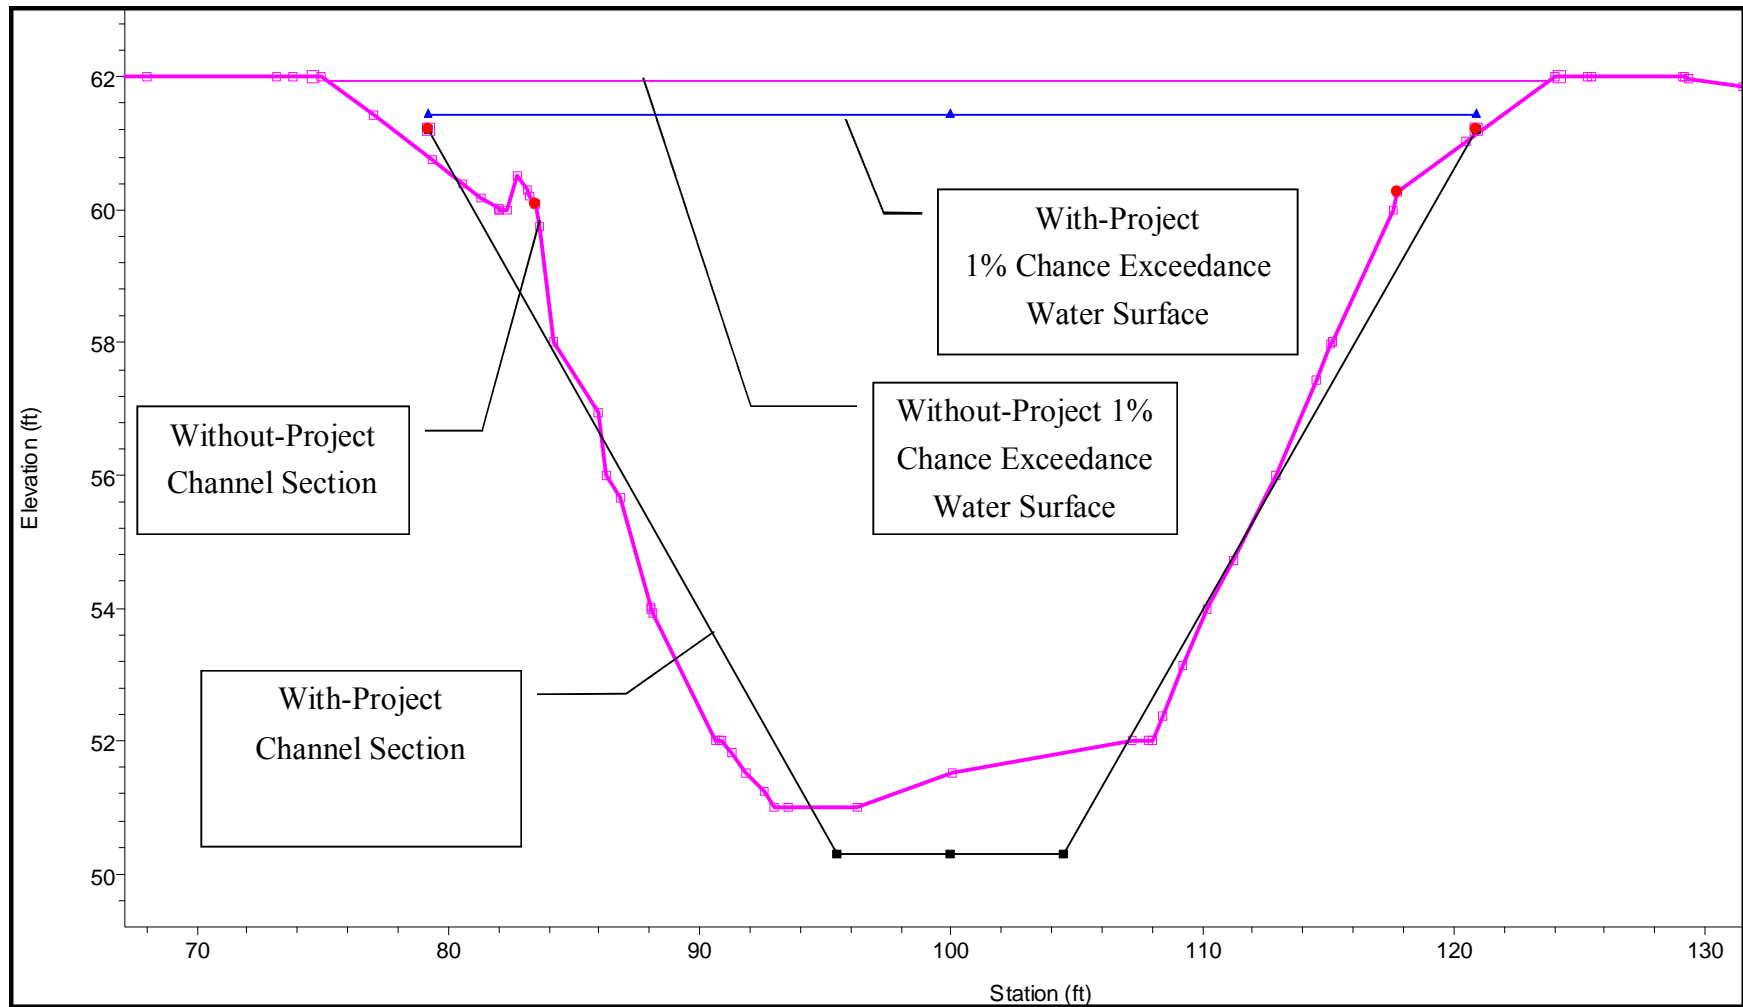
Typical D/S section, with- and without-project conditions for Alternative 5
